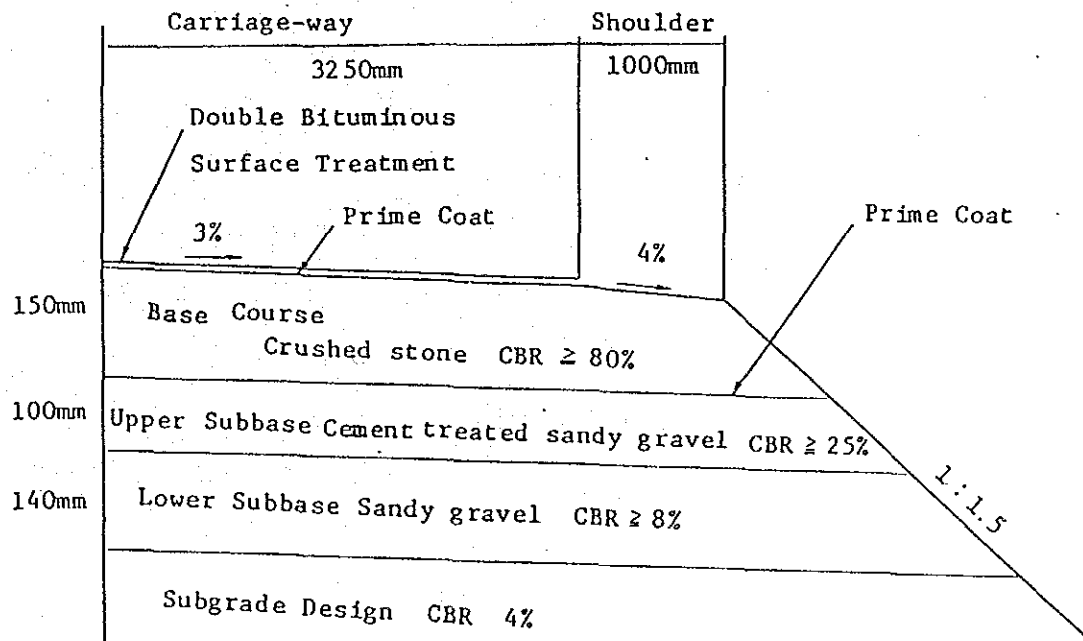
PAVEMENT DESIGN PROPOSED FOR LOT I
